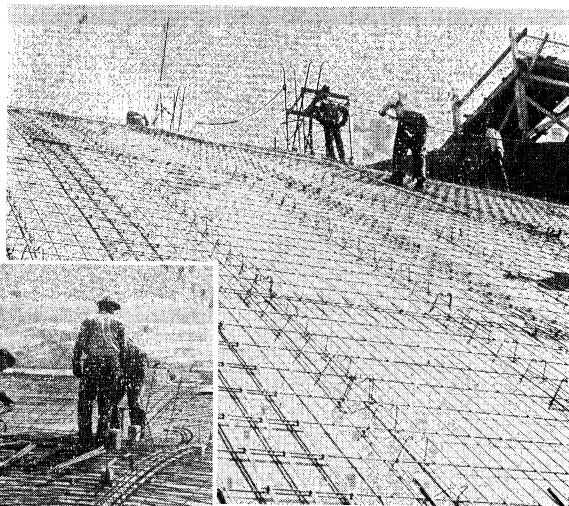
(left)—Details of reinforcing, mesh mats, and bar supports for warehouse roof
